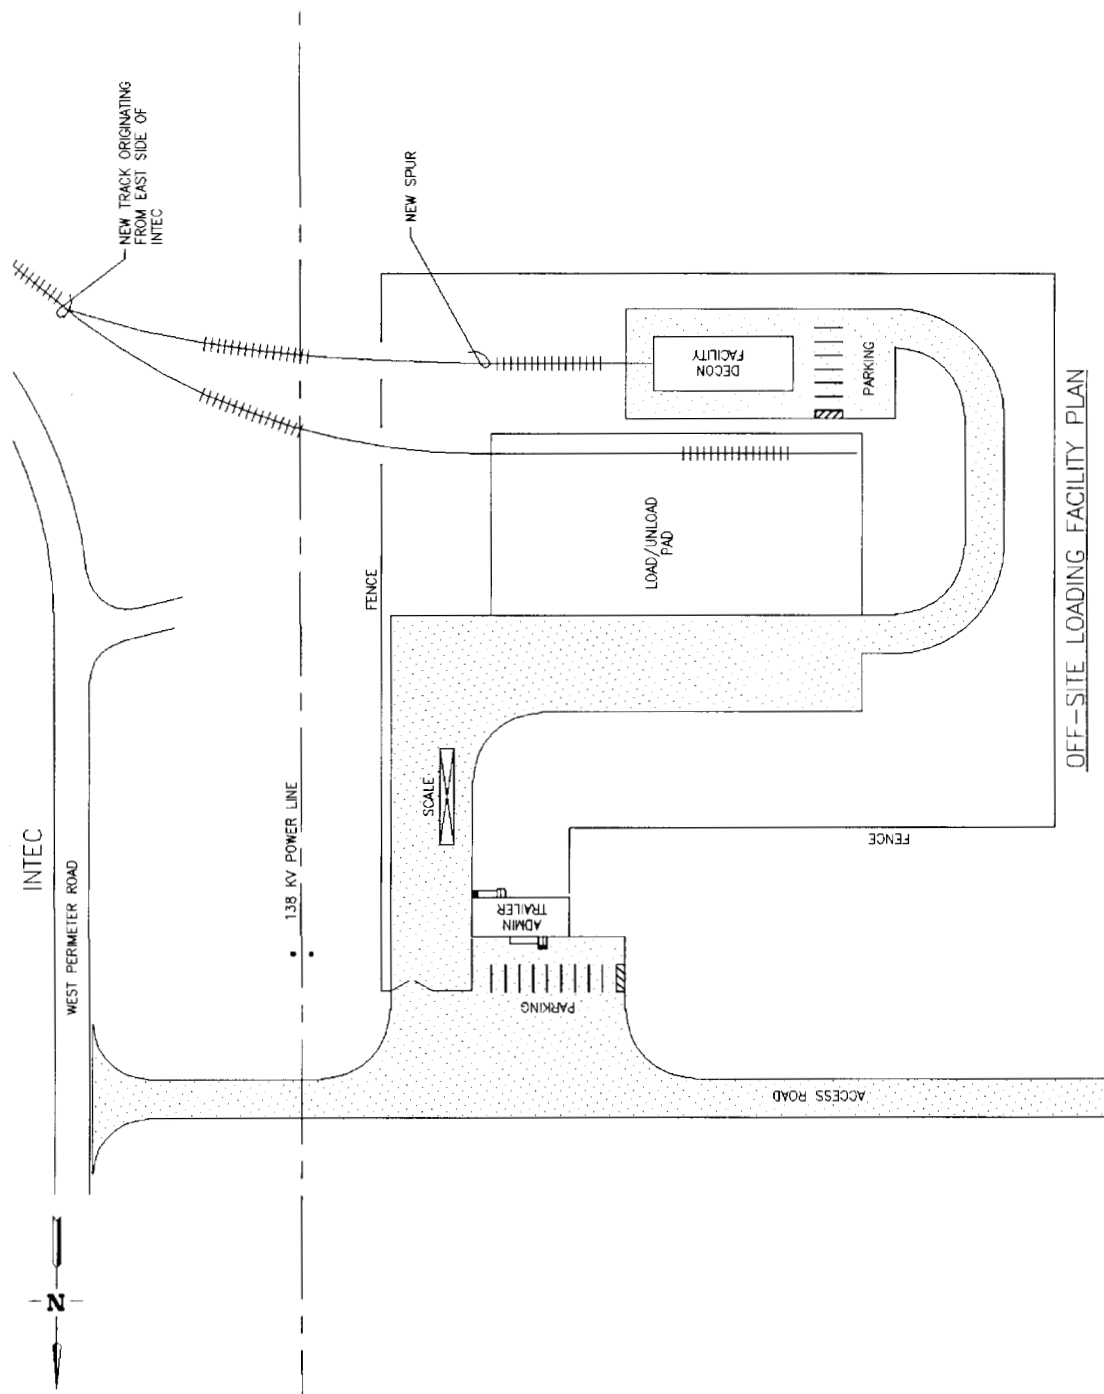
Plan view conceptual layout drawing showing the major facilities that would comprise the off-site shipping facility (need to add another rail line next to fence for staging loaded railroad cars).
